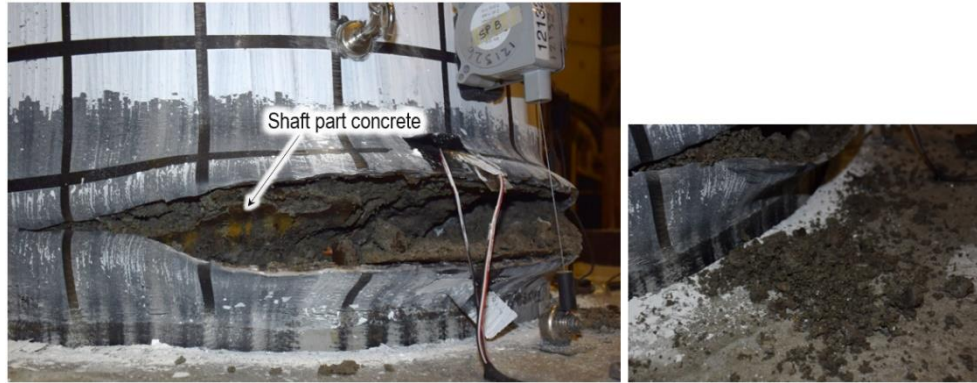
Tearing of steel tube at the lower part of Specimen S2R before tube rupture.
